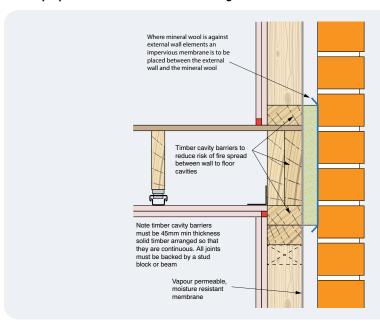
Fire-protected timber frame wall /floor junction with integral cavity barriers – beams parallel to wall Class 2 building.
